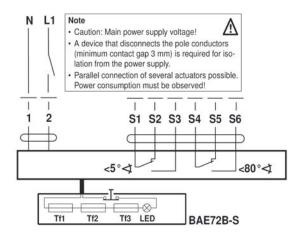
Wiring scheme of actuator BELIMO BLF230-T
